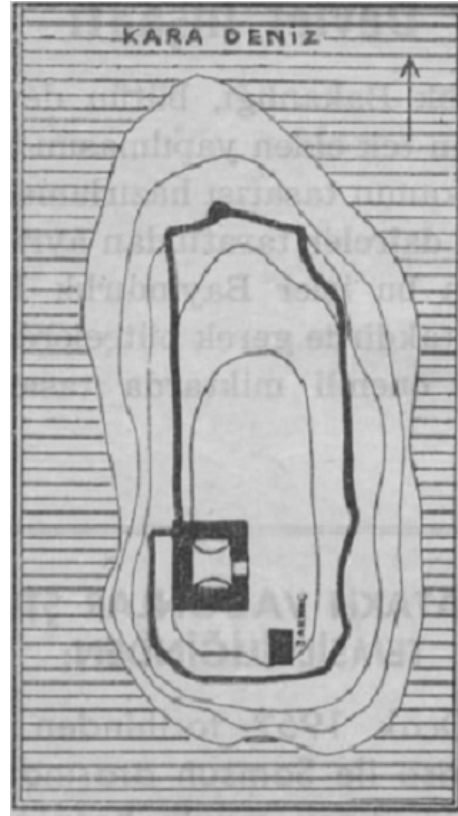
A plan of Şile Castle on Ocaklı Island, where the main tower building, surrounding lower walls, and the cistern in the south are shown (Fıratlı, 1952).
